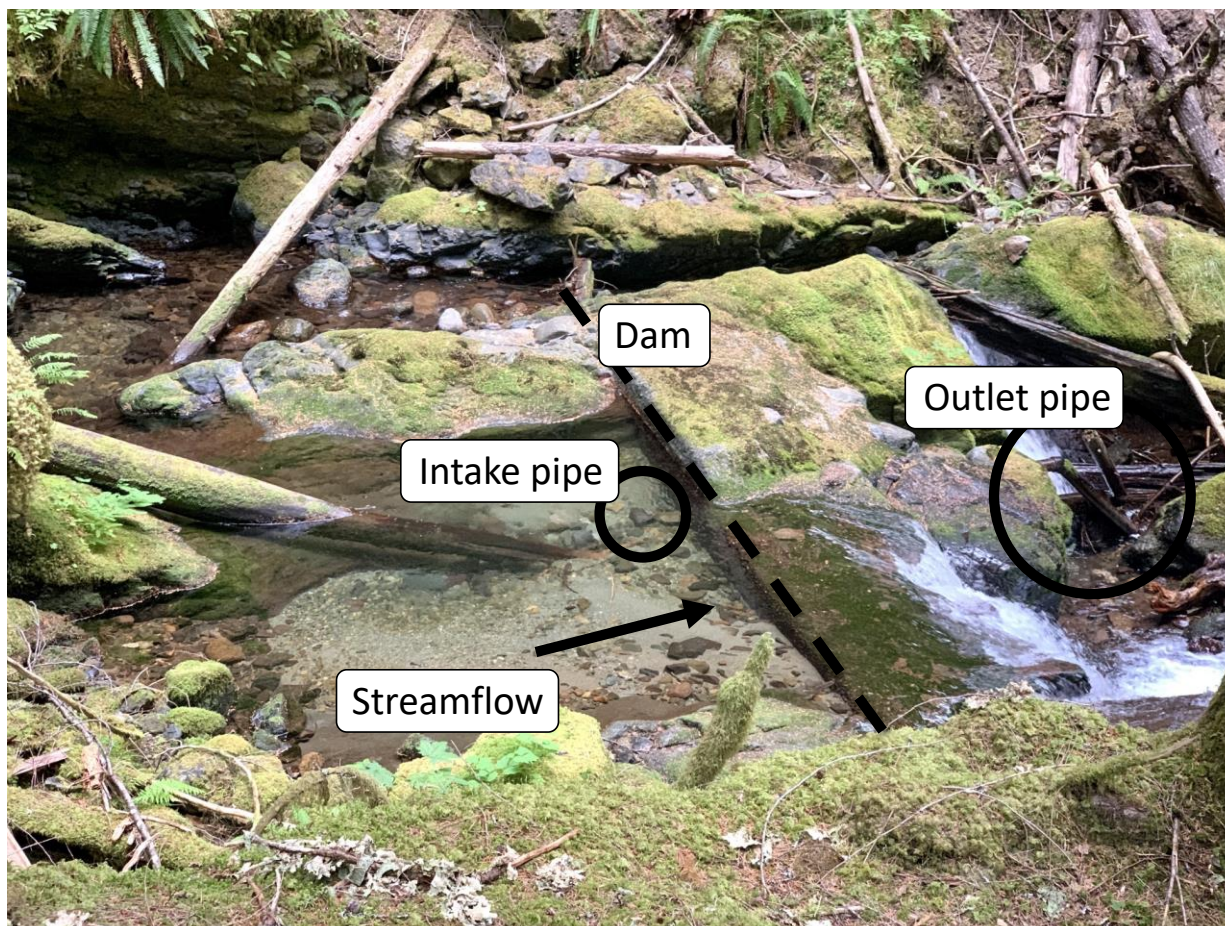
Photo of abandoned Ohanapecosh water intake on Laughingwater Creek, August 2021. Note the concrete dam in the center of photo, partially covered intake pipe to the left of the dam, and damaged outlet pipe to the right of the dam. Streamflow is toward the right.
